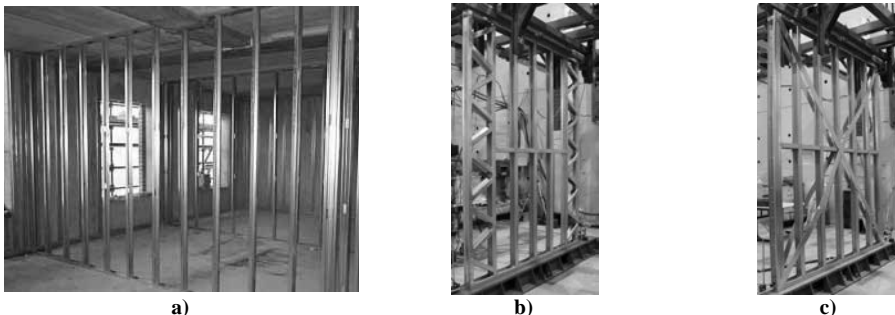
Examples of walls: a) without any bracing system; b) with truss bracings at each end; c) with diagonal straps.
